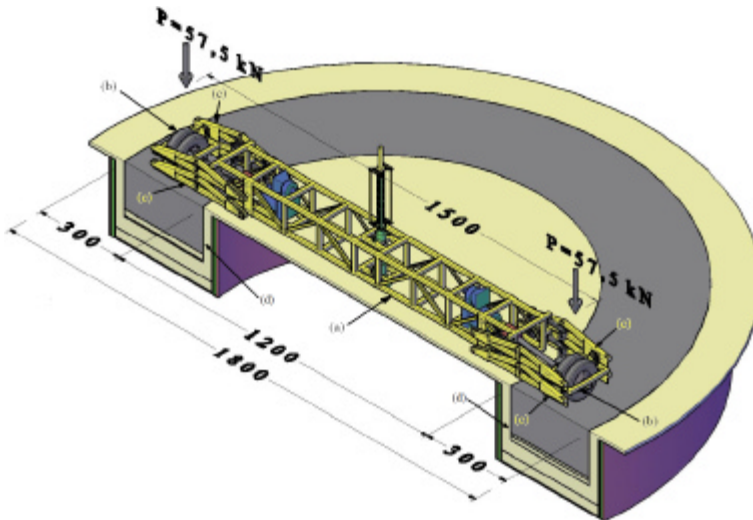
The ALT-LIRA facility from Technical University „Gh. Asachi” Iasi: a) the main steel structure; b) the wheel assembly; c) supporting girders; d) the circular sink
